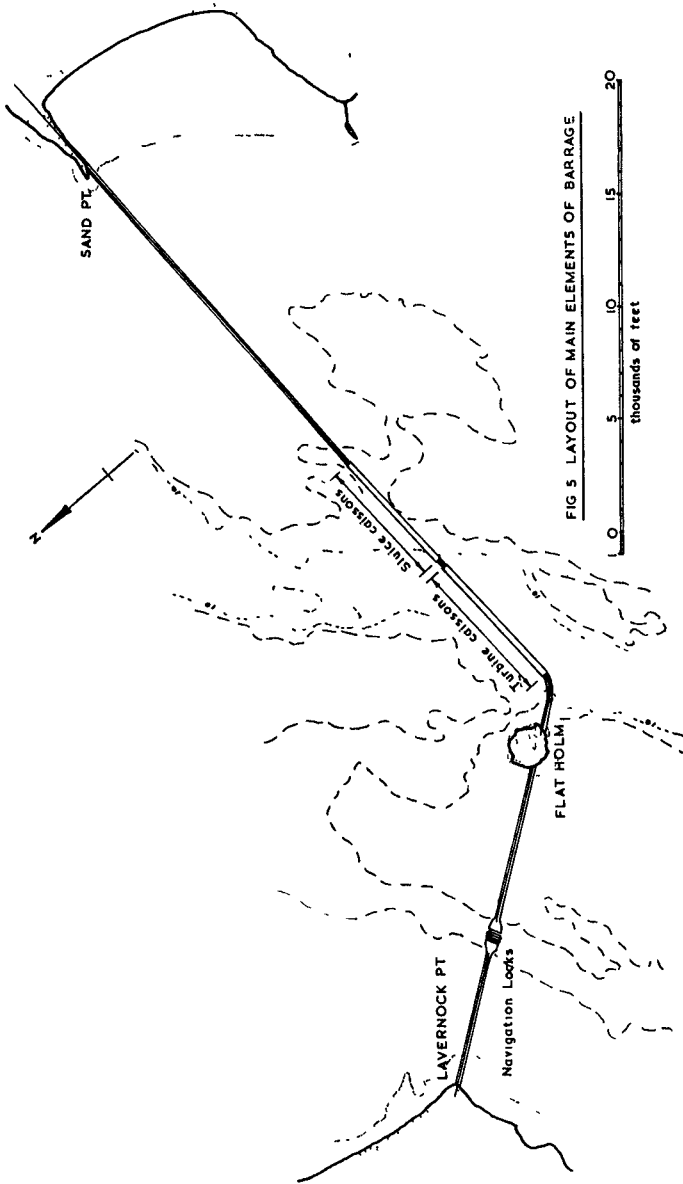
LAYOUT OF MAIN ELEMENTS OF BARRAGE
